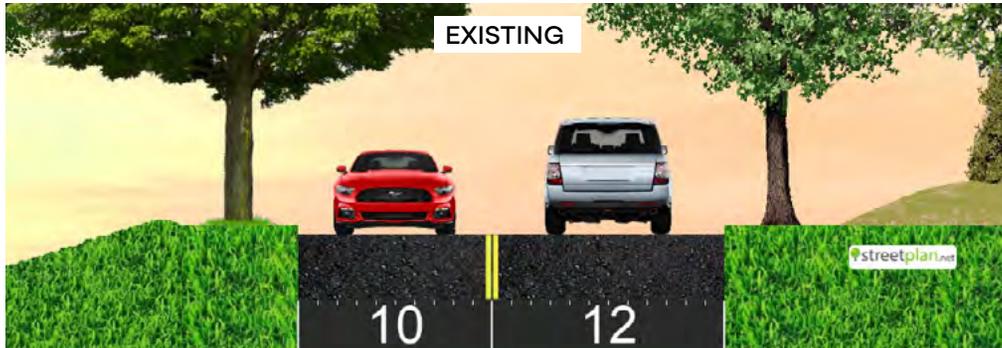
Existing Conditions: PVR West of Rodman Drive, looking east
